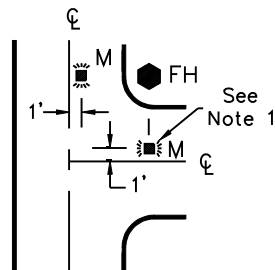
City of Scottsdale Standard Details	APPROVED BY: Scottsdale Standards & Specifications Committee	3" AND LARGER FIRE LINE CONNECTION	DETAIL NO. 2362-2
